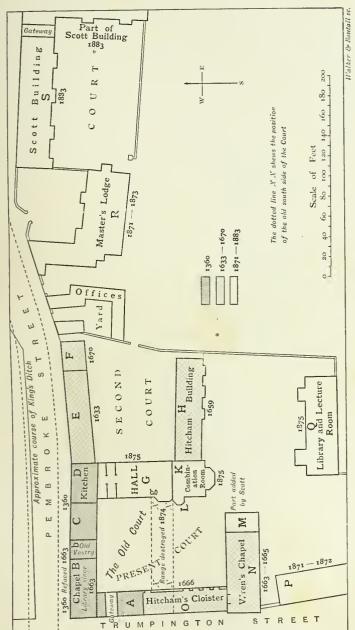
PLAN OF PEMBROKE COLLEGE.
